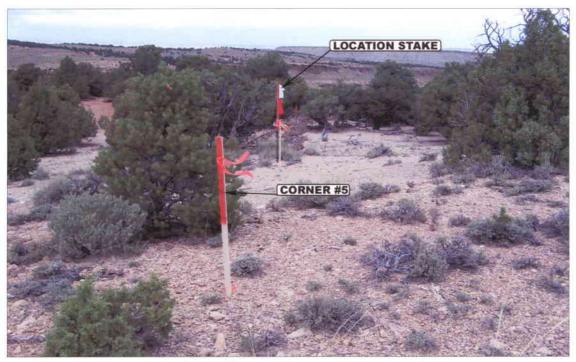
PHOTO: VIEW FROM CORNER #5 TO LOCATION STAKE
